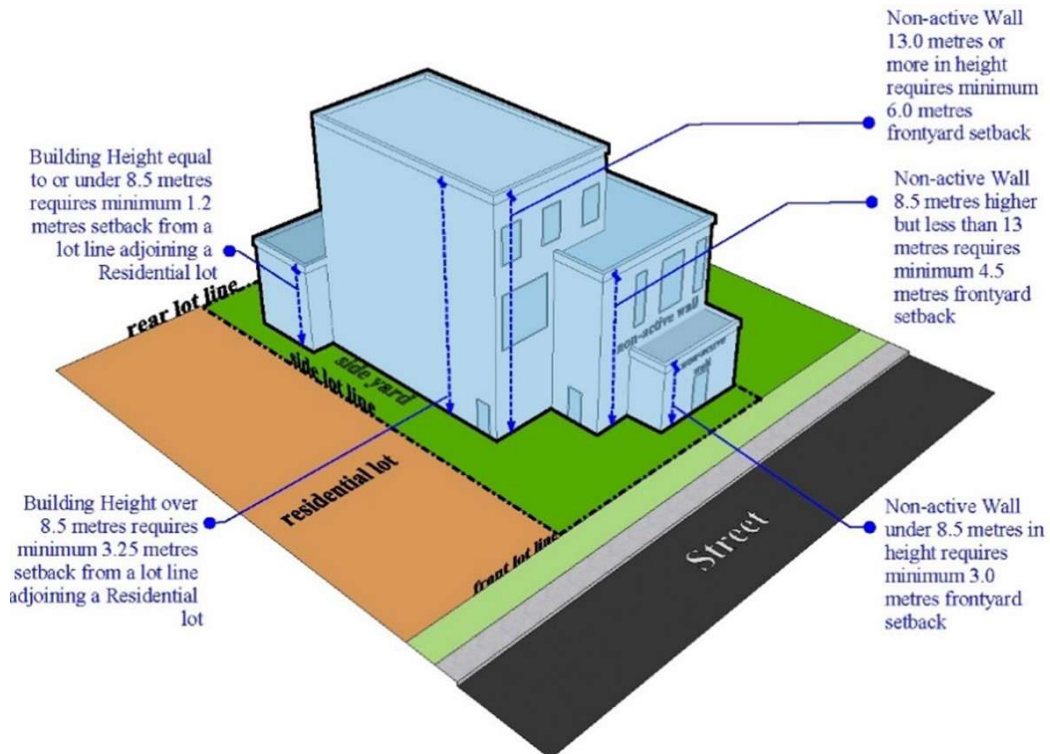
B.F3: Mixed High-Rise Zone Non-Active Wall
